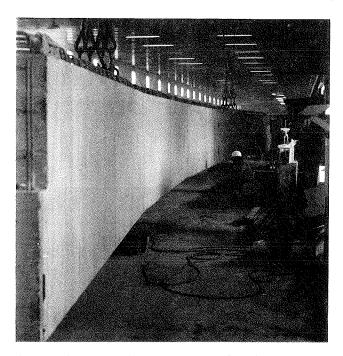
Completed girder being prepared for shipment to bridge site.
